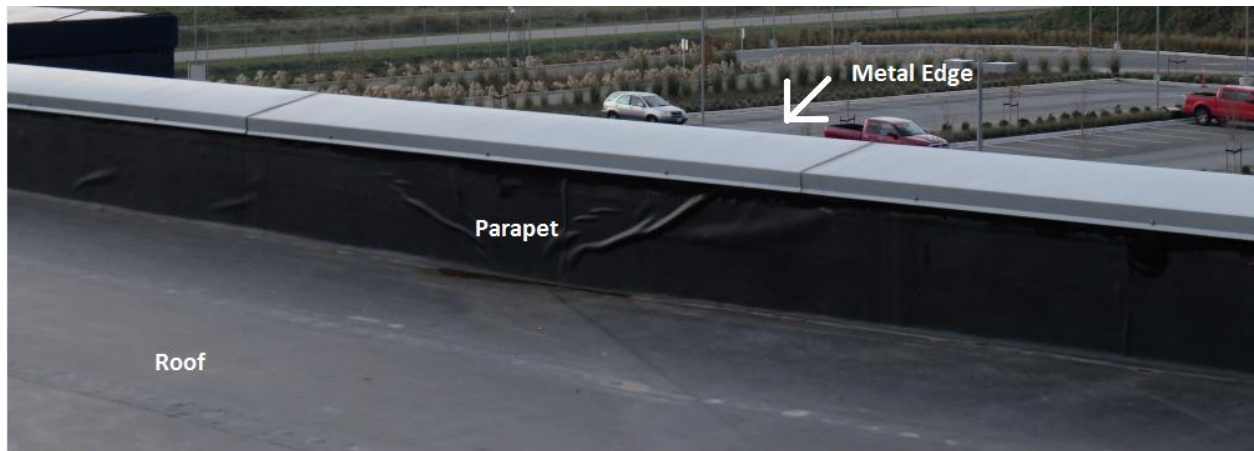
Parapet connecting the roof and wall (Courtesy of NRCC)
